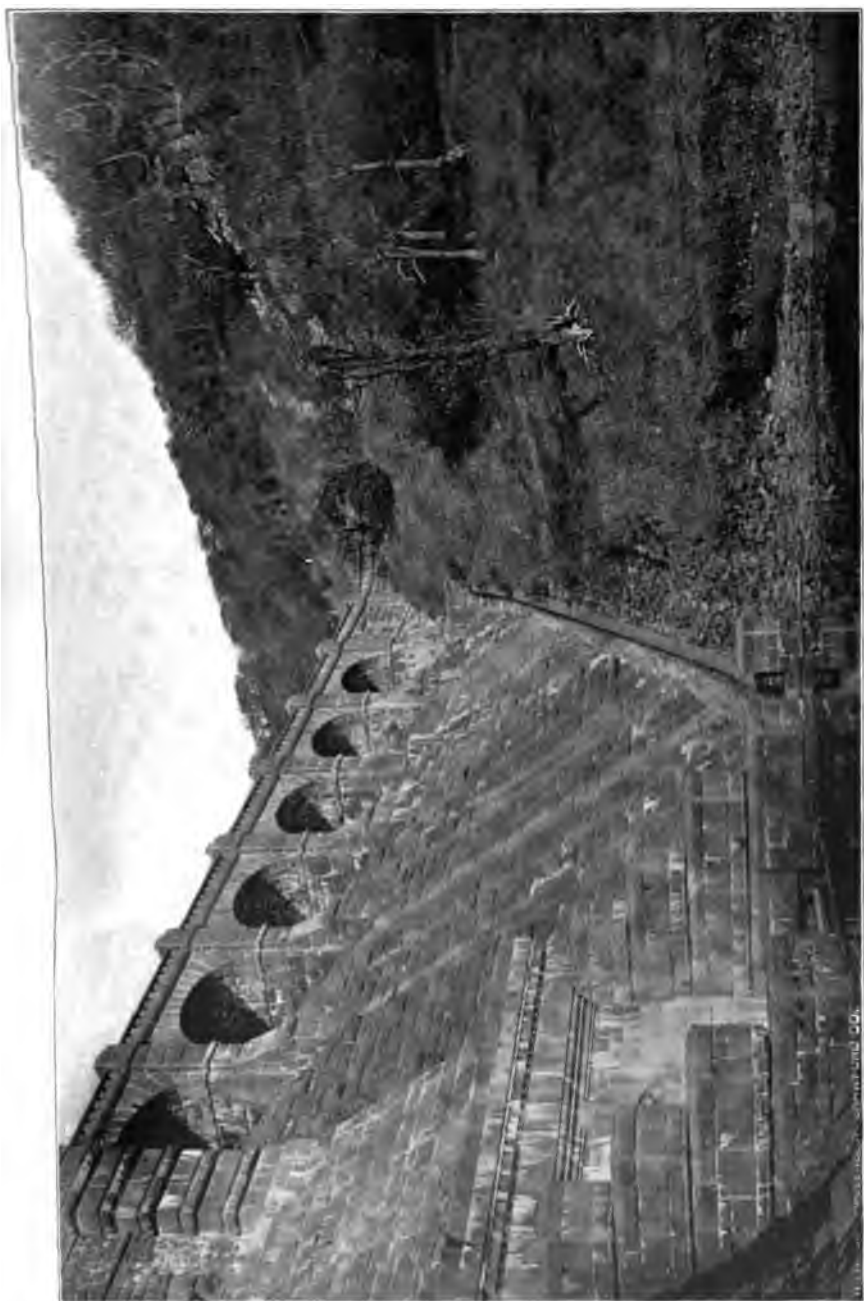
VIEW OF END OF VYRNWY DAM SHOWING CATCH GUTTER.
